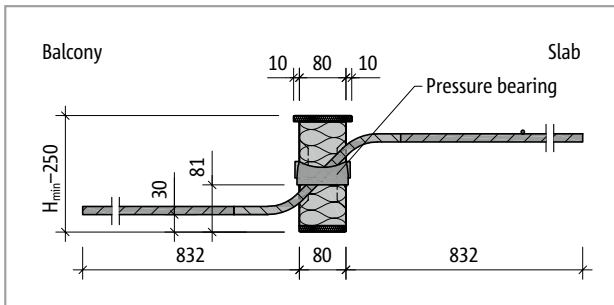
Schöck Isokorb® T type Q-V12: Product section
